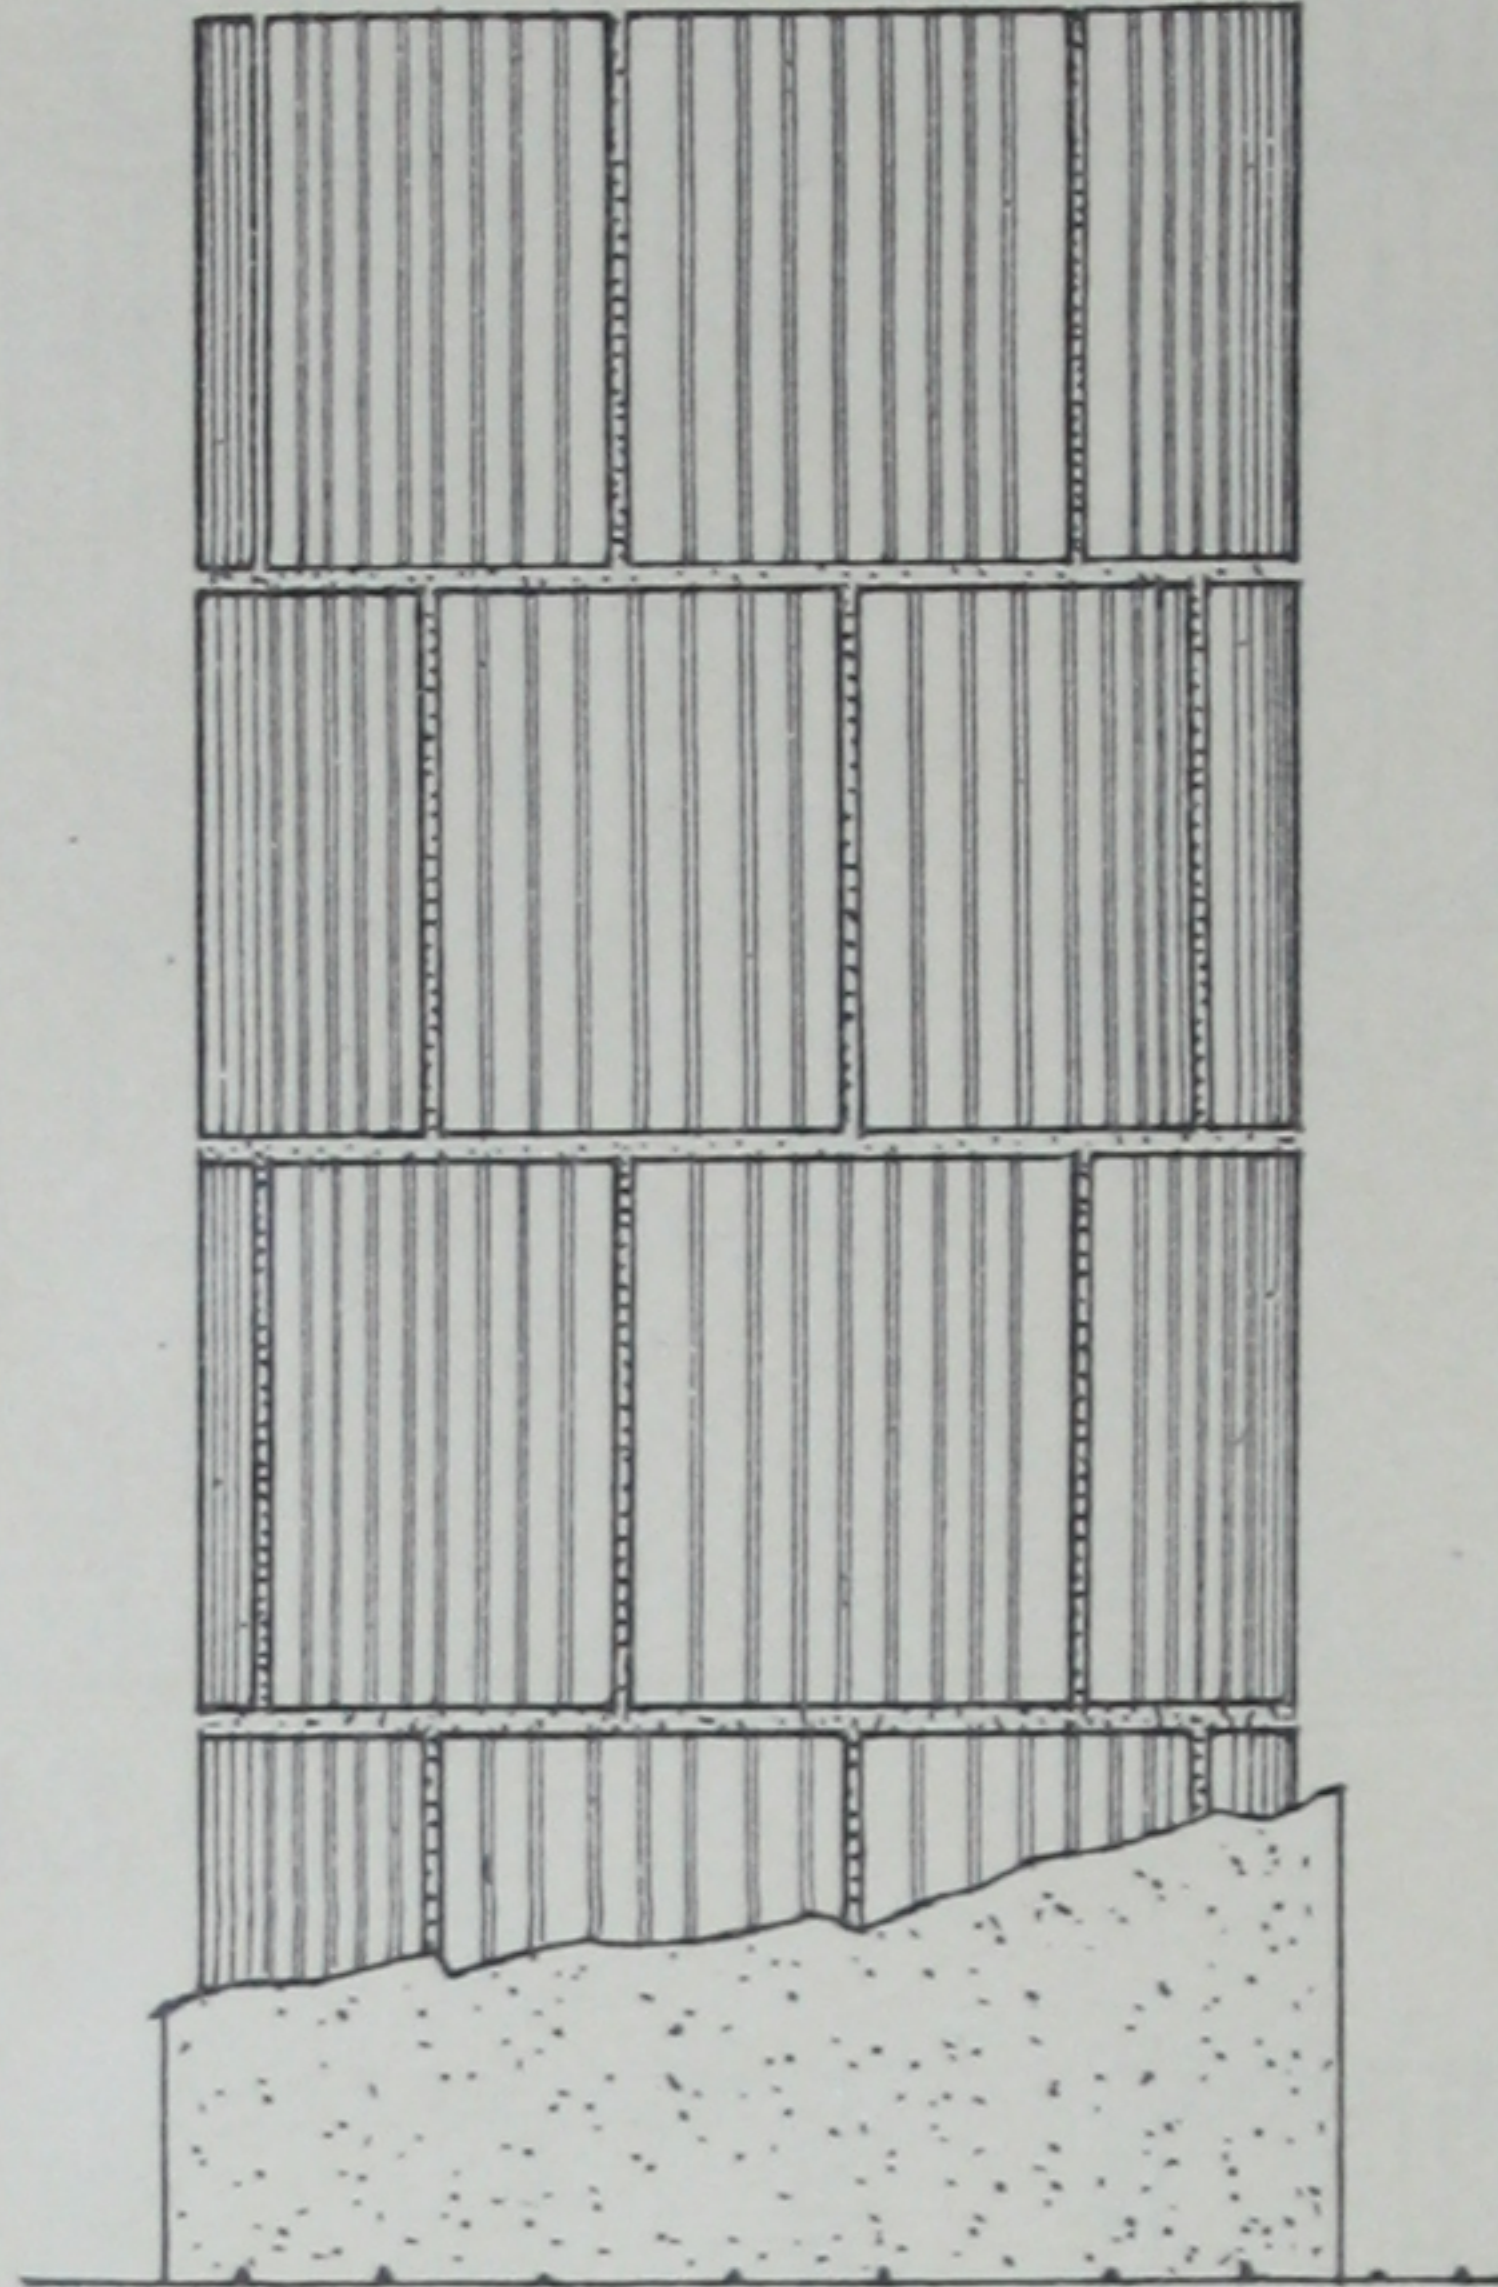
DETAIL OF HOLLOW TILE PIERS WITH STVCCO COVERING.
